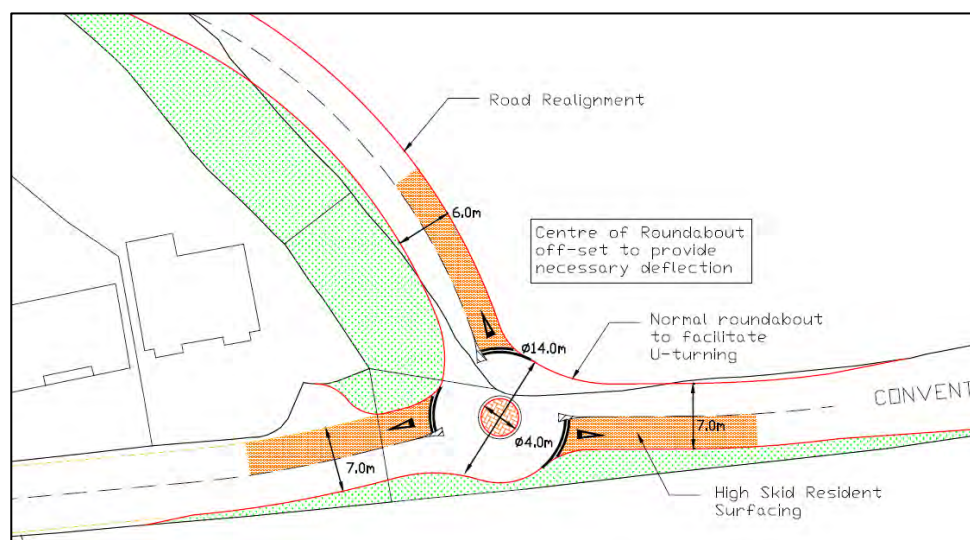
Proposed roundabout on Convent Hill to the west of St. Padraig's Boys NS
